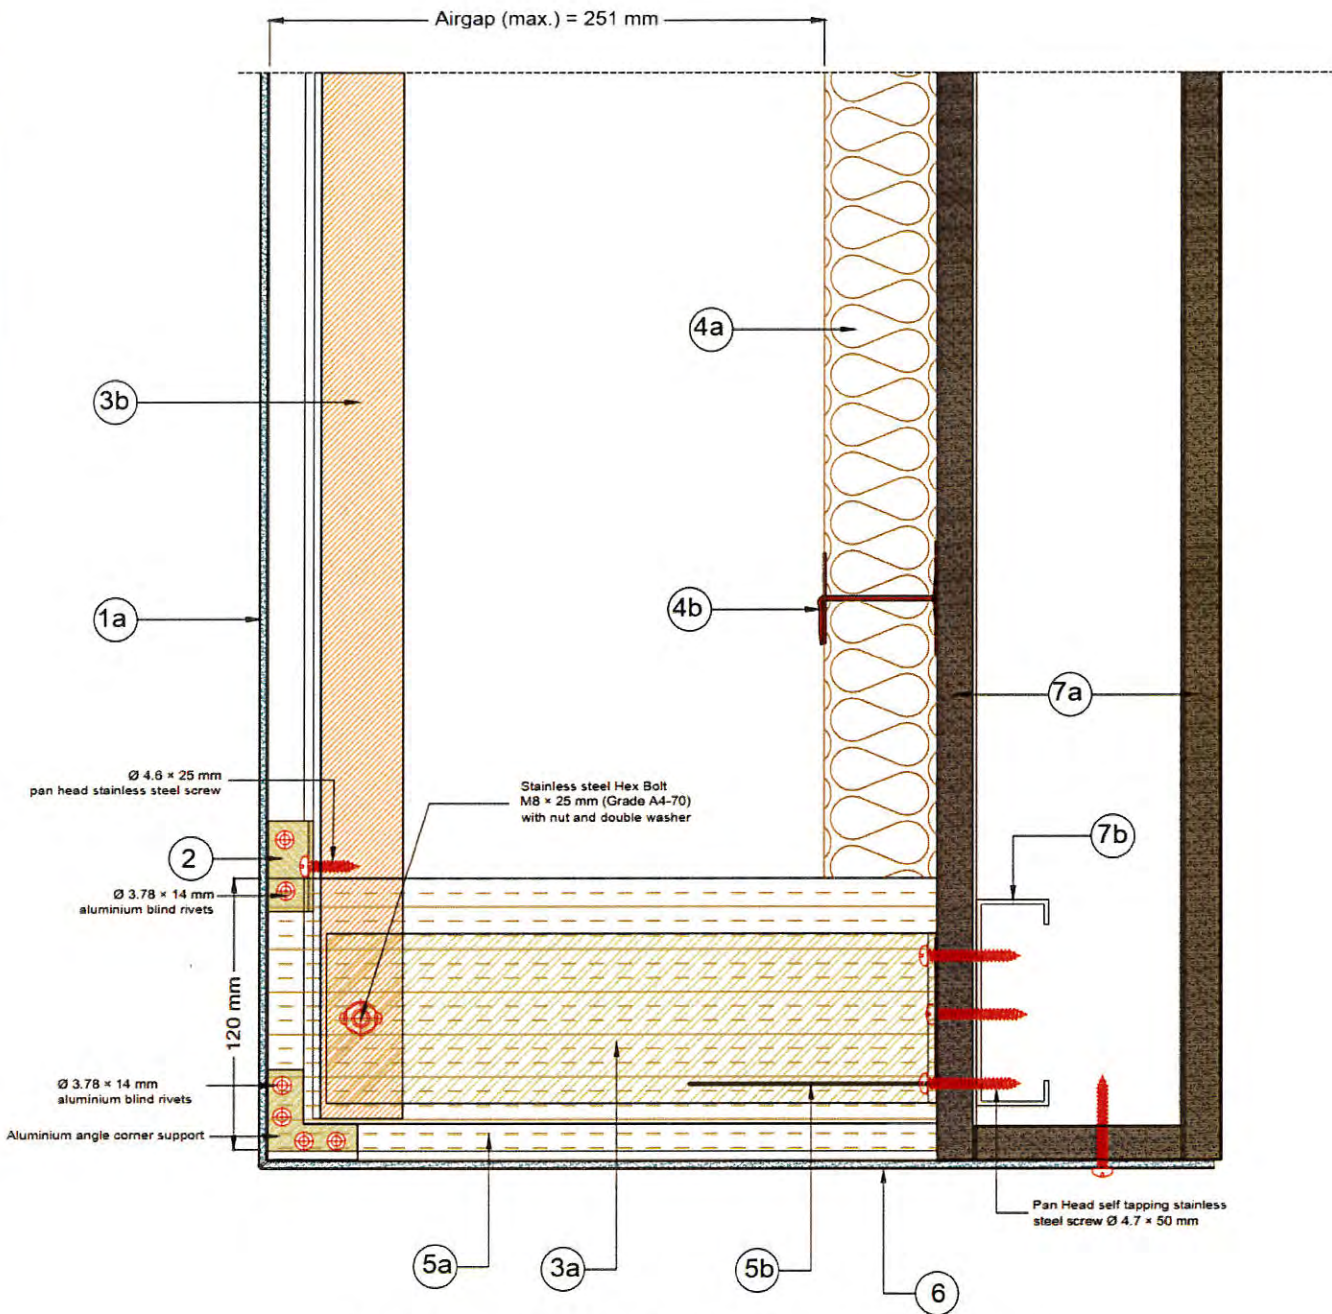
"Emerge U.K. FR A2" 4 mm thick Aluminium Composite Material Exterior Wall Cladding Assembly vertical section window details
